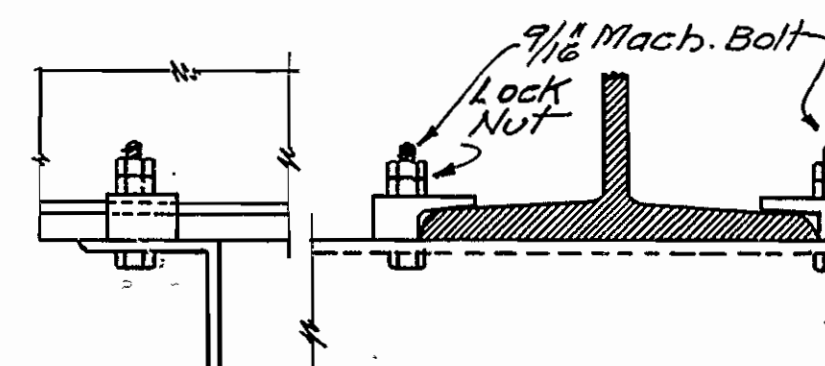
DETAIL OF BEARING PLATE Scale 1 1/2" = 1'-0"
